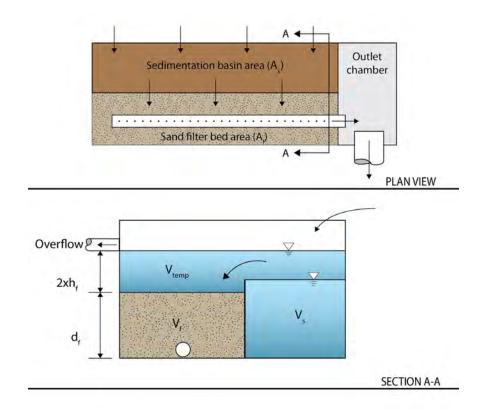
Perimeter Sand Filter Volumes (Source: GDOT Drainage Manual, 2014)
